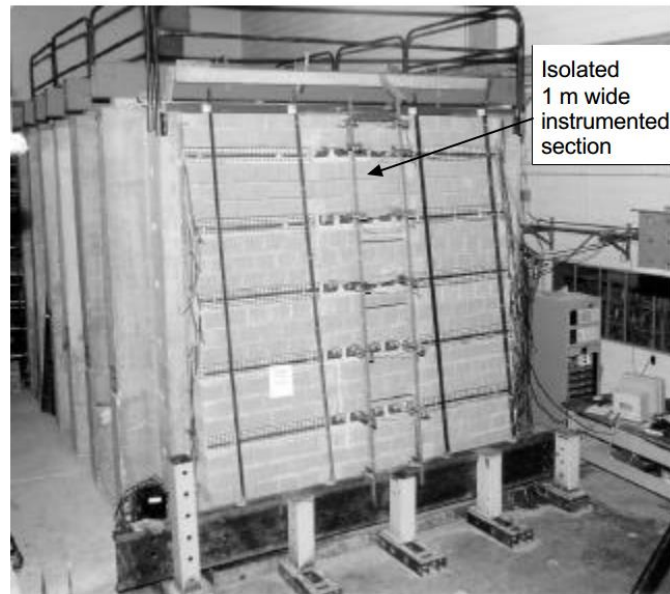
Instrumented Reinforced soil wall (Bathurst et al. 2009)
